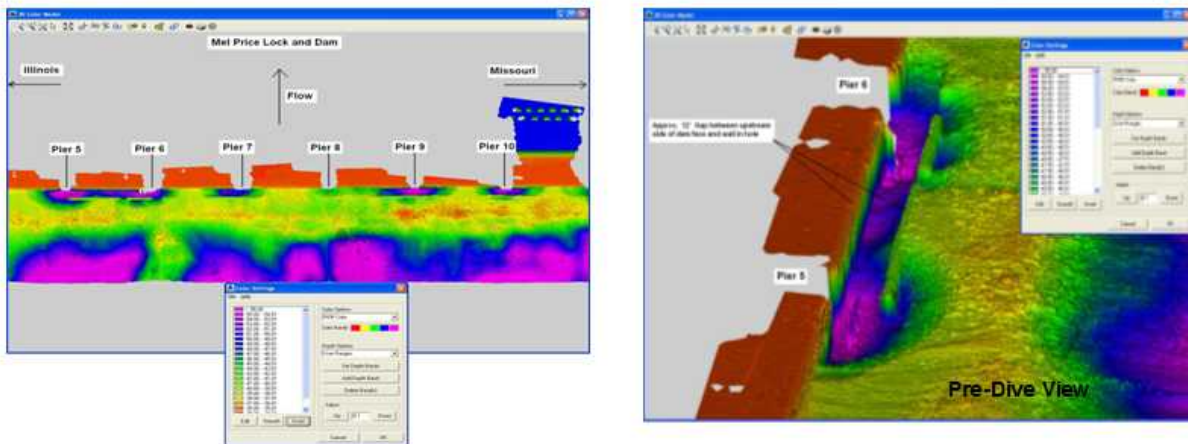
On left, initial plan of multibeam survey at Mel Price Lock & Dam (Mississippi River). Significant scour (15 to 20 ft below normal grade) was indicated at piers 5, 6, 9, and 10. On right, 3D detail model of Pier 5 and 6 scour area furnished to divers. (St. Louis District)
